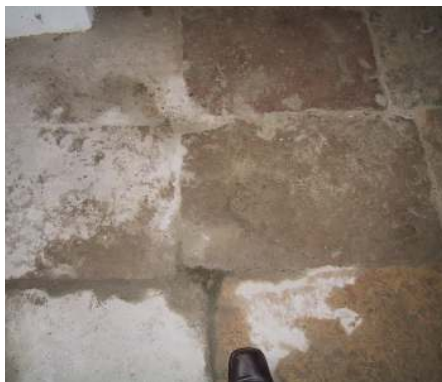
Tide-mill: moisture stains, probably due to dew point condensation, on the stone pavement of the ground floor. On a dark and rainy autumn day, rain stopped and sun quickly appeared. A much higher temperature was rapidly reached outside the mill, due to the high solar radiation. The temperature inside the mill became clearly lower than outside. The RH inside the mill increased rapidly and moisture spots appeared on the floor.
